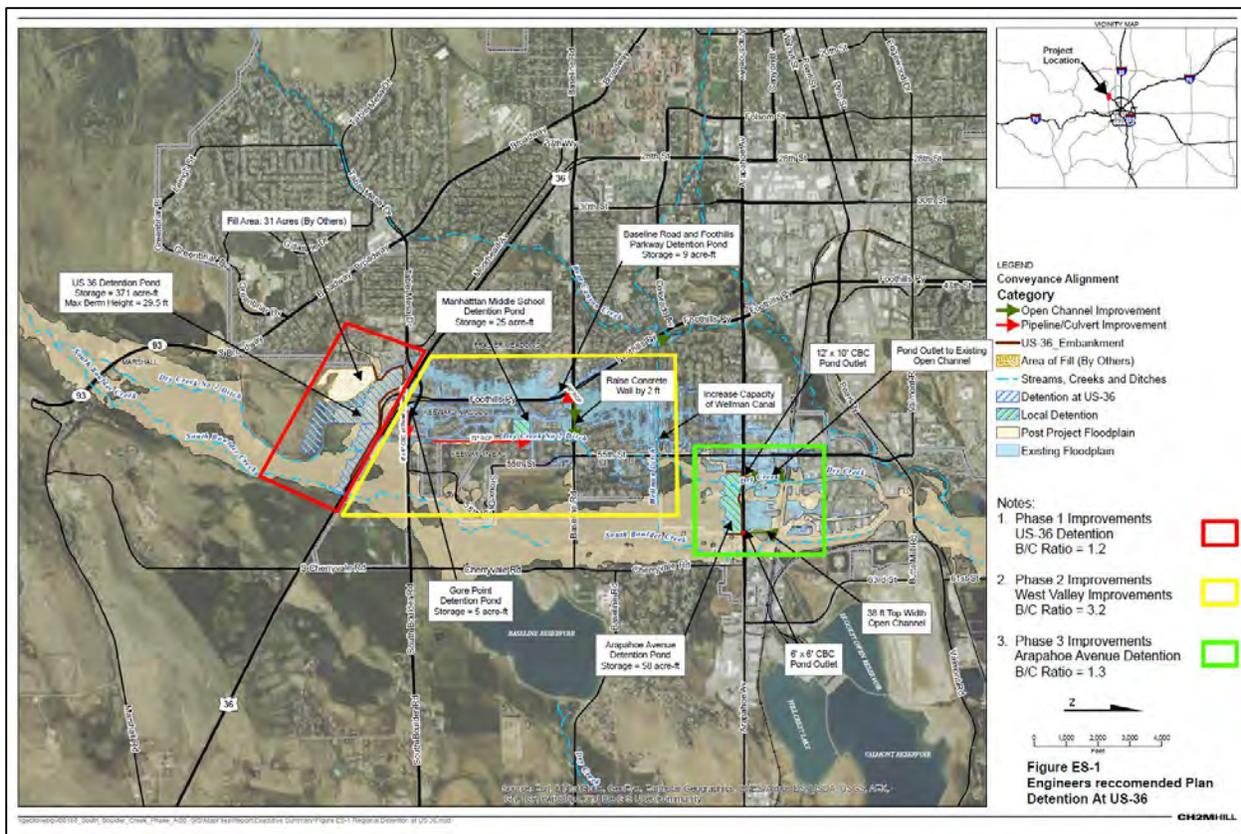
Recommended Flood Mitigation Plan Project Elements
